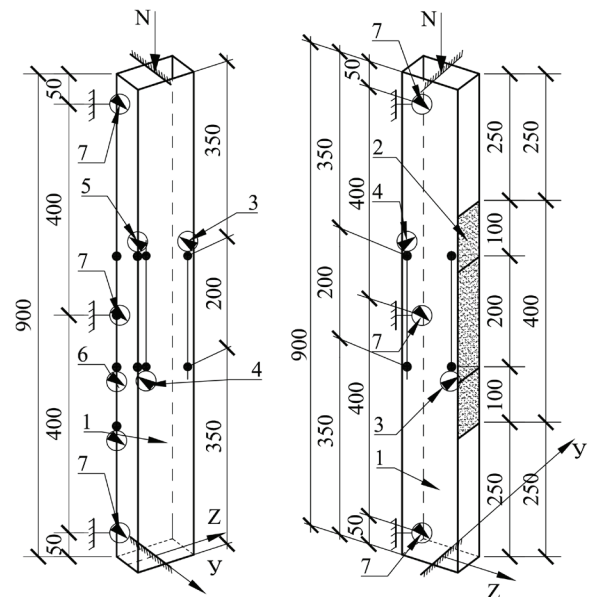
Layout of devices: 1 – test column; 2 – speckle surface for deformation measurement using the DIC method; 3 – ME-1 mechanical extensometer; 4 – ME-2 mechanical extensometer; 5 – ME-3 mechanical extensometer; 6 – ME-4 mechanical extensometer; 7 – Aistov’s PAO-67 deflectometer
